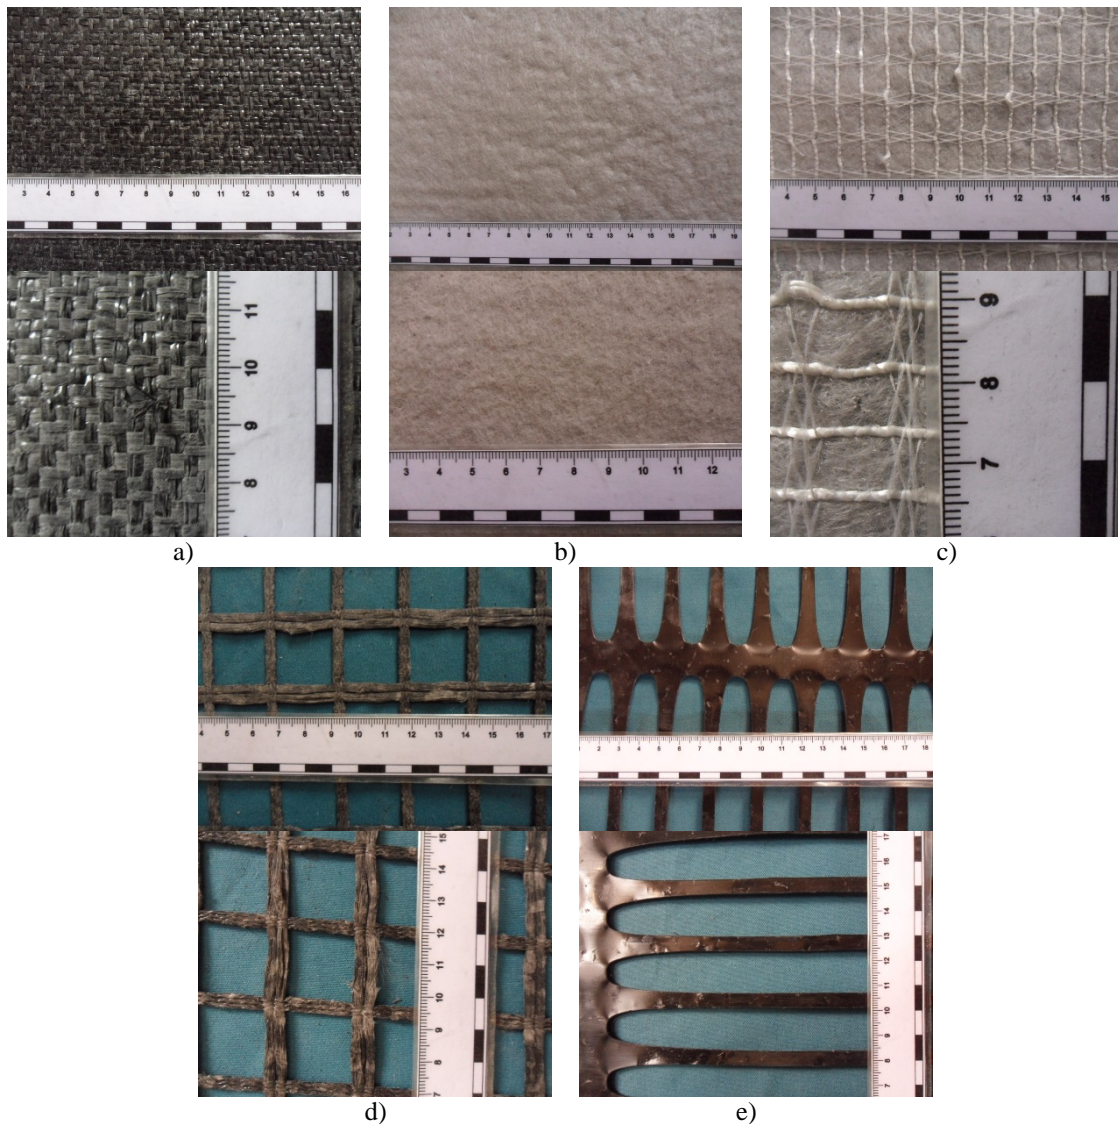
Examples of the visual inspection of specimens submitted to laboratory mechanical damage (LAB D): a) GTXw; b) GTXn; c) GCR; d) GGRw; e) GGRu.
